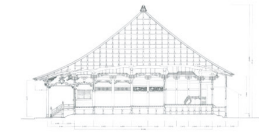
Cross section of Senjo-ji Temple Hall[5]
